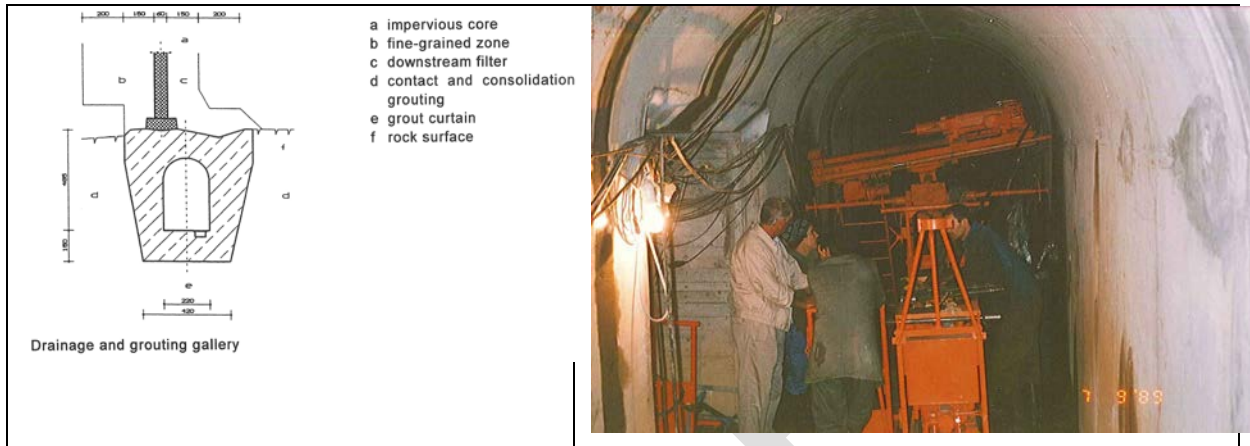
Drainage and grouting gallery, Feistritzbach Dam, Austria
